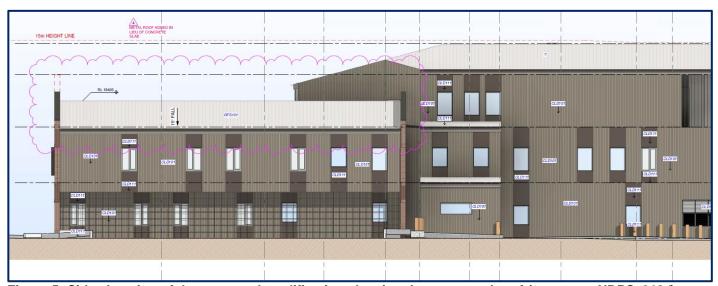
Side elevation of the proposed modification showing the new metal roof (courtesy: NBRS, 2024)
